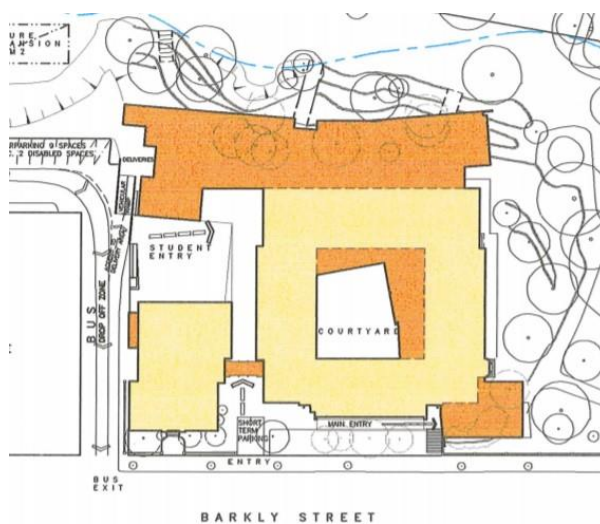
Detail, Site Plan (SK-07) Ballarat Secondary College, 1998. (Source: Cox Architecture)
